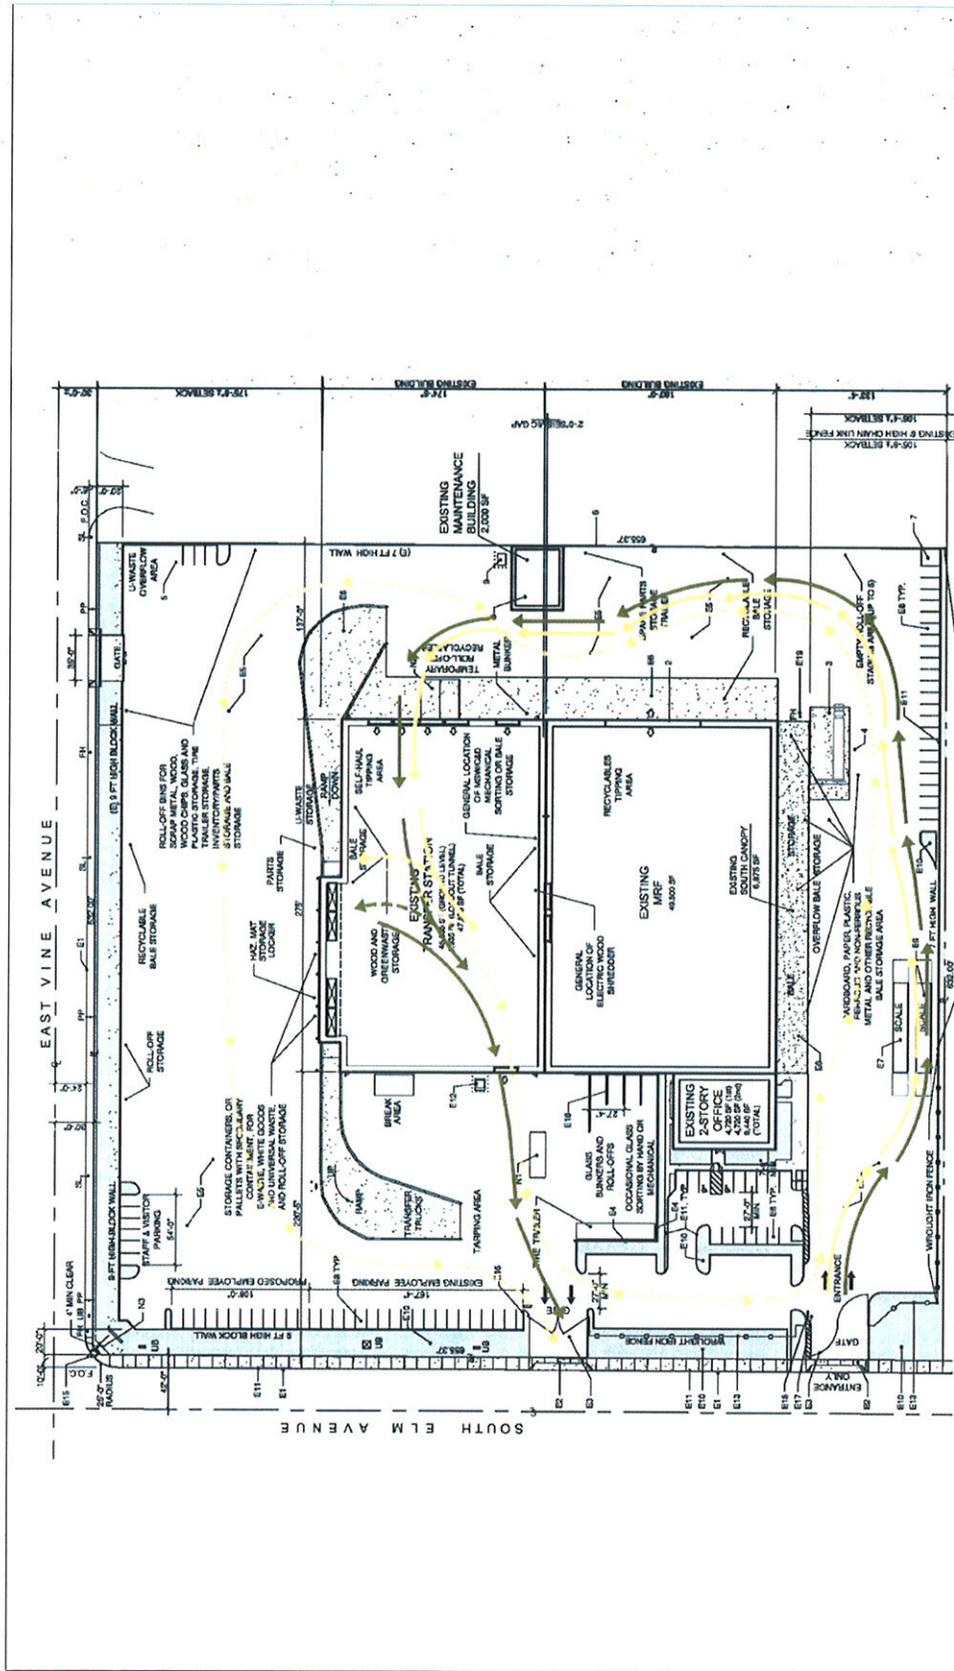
C: ROLL-OFF TRUCKS ON-SITE CIRCULATION PLAN
